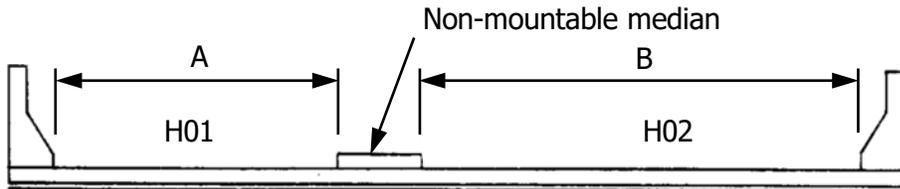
Cross-section view of two highway features carried on the bridge with a non-mountable median.
